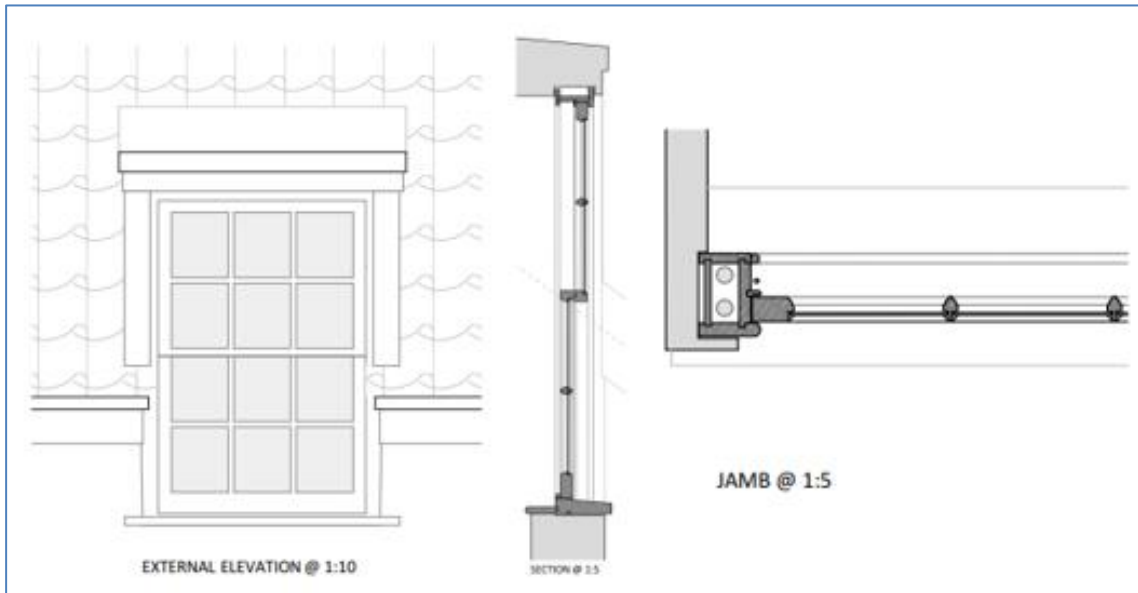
Extract from plans showing details of North Wing Windows (FW5-8)
